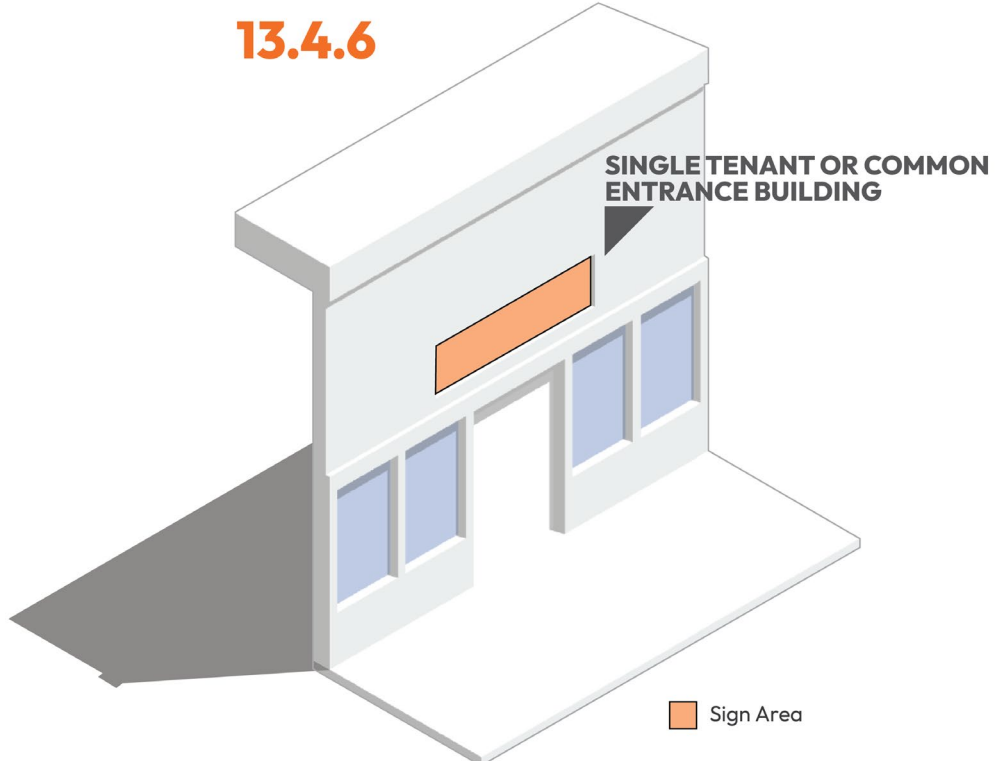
Wall Signs - Single Tenant and Common Entrance Buildings
